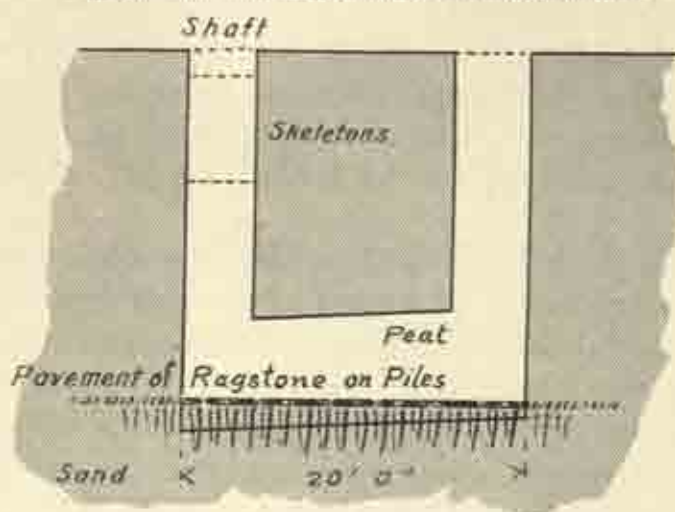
Section of shafts and tunnel, showing position of Roman pavement.
